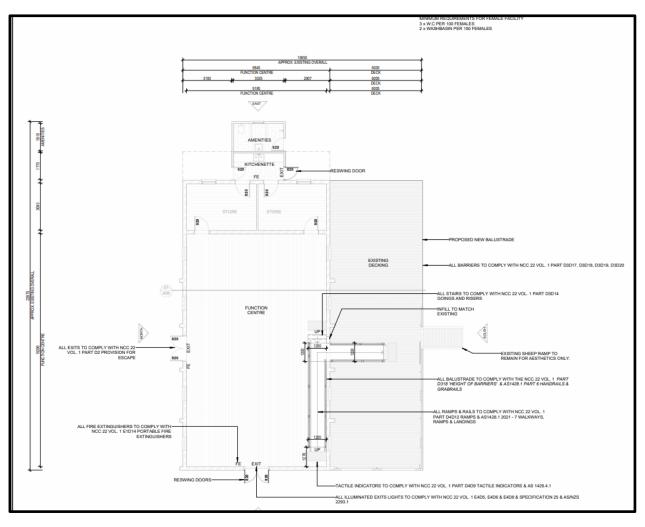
Proposed Floor Plan Function Centre - Lot 1 (Source: Reward Character Designs)
